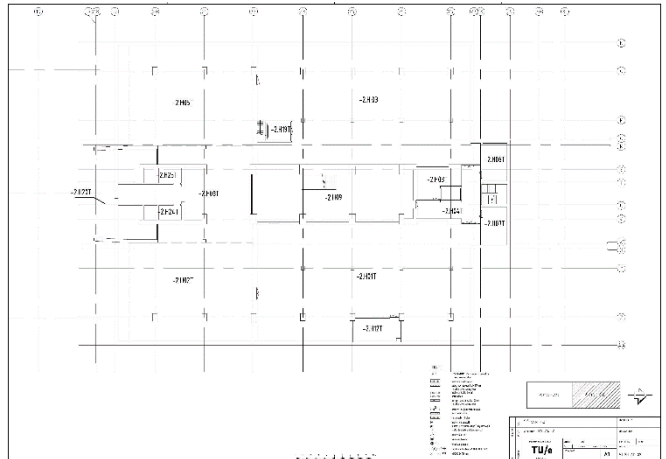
Floorplan of -1st floor of the Vertigo.
